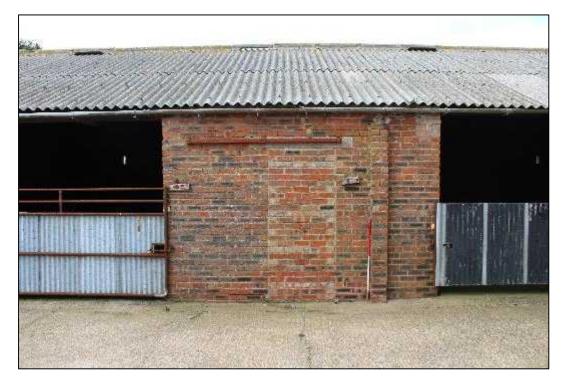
Building G, exterior, east elevation, former doorway (Feature 112)
